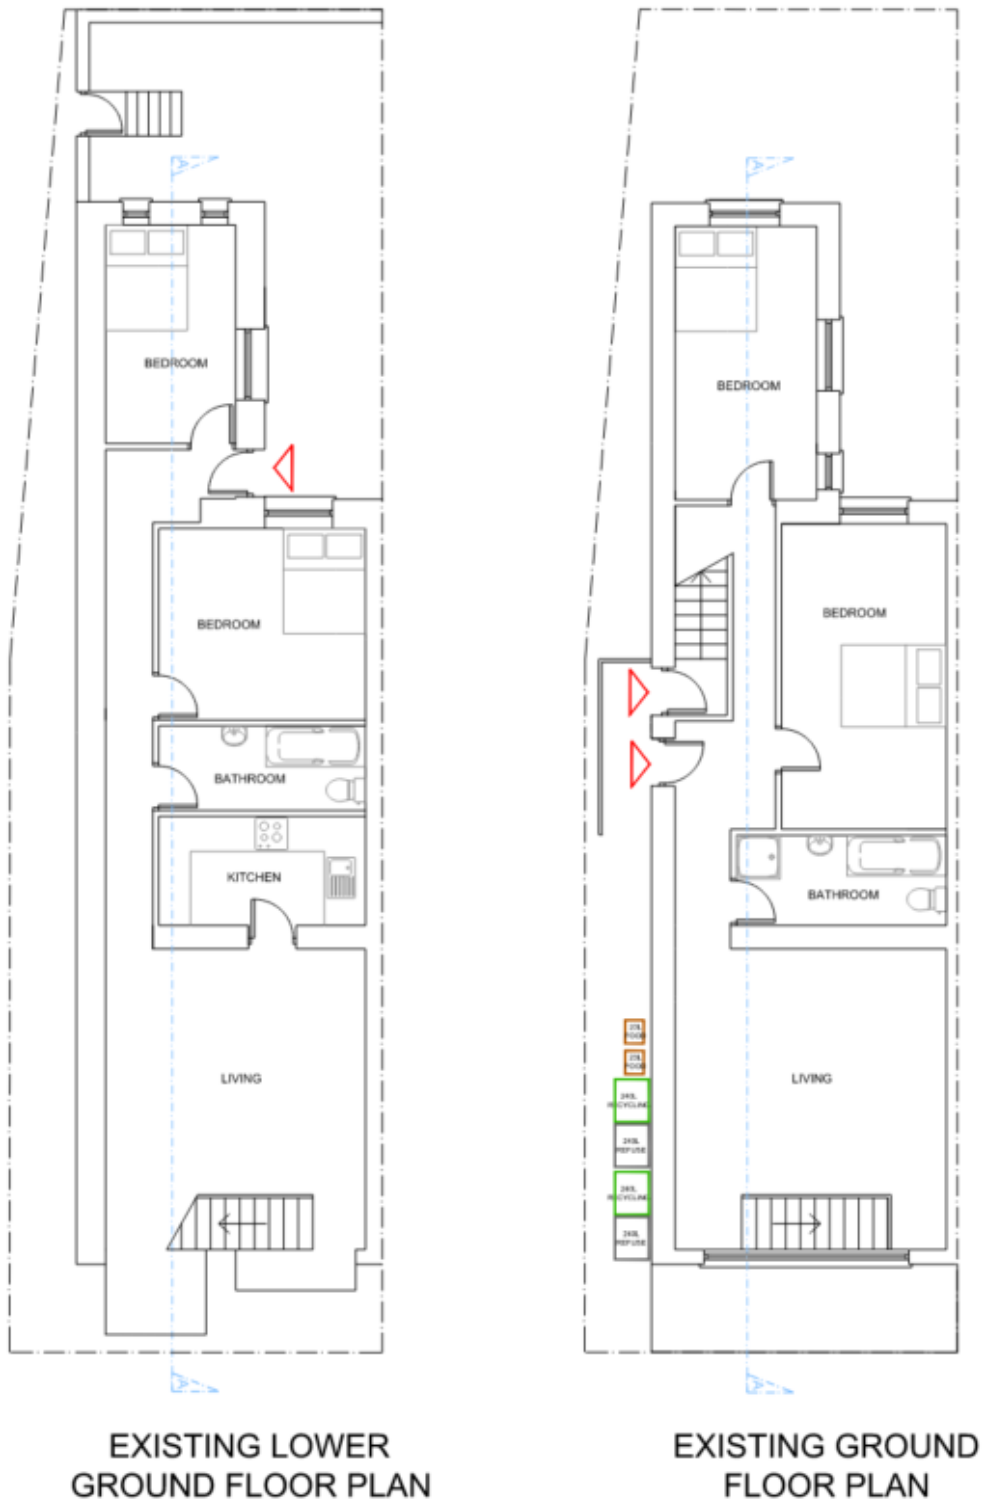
Existing basement (lower ground floor) and ground floor plans.
